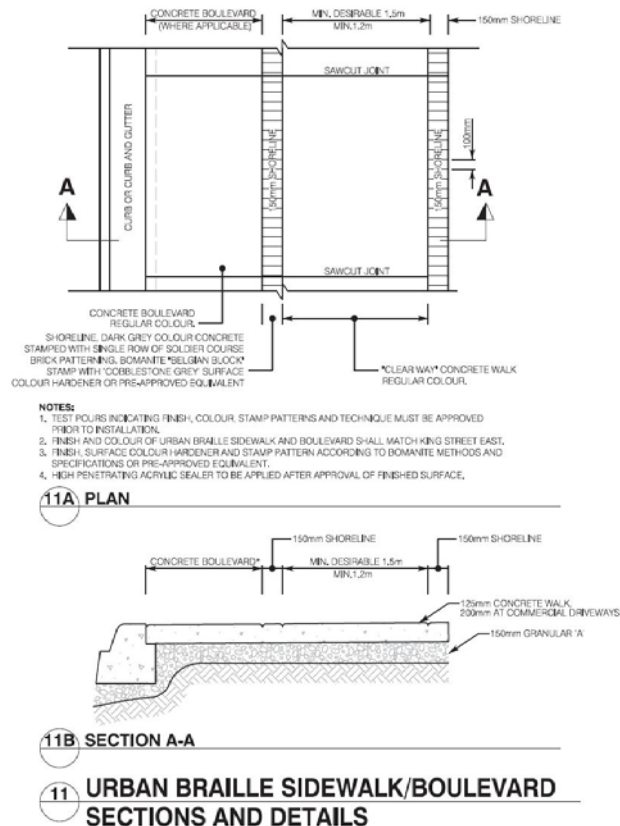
Urban Braille System Design Guideline Sidewalk Detail, incorporated in UDB and Landscape Architectural Drawings by Whitehouse (Source: City of Hamilton)
